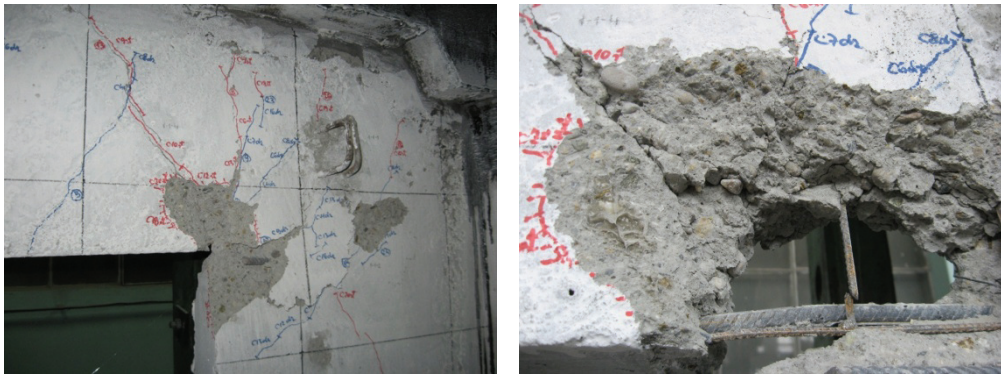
Failure detail PRCWP 5-S/E3-T: concrete crushing at the spandrel-to-pier#2 connection (close-up on observation grid 1-1)
